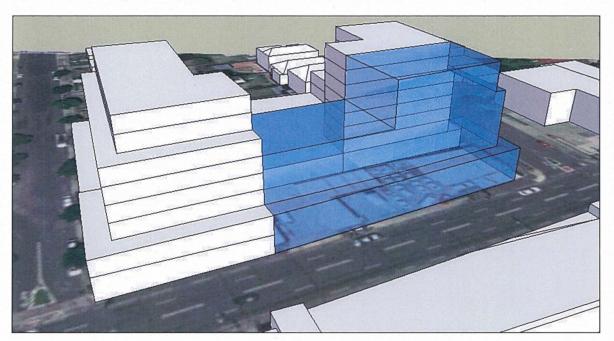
Building Envelope – total block looking south from Canterbury Road
